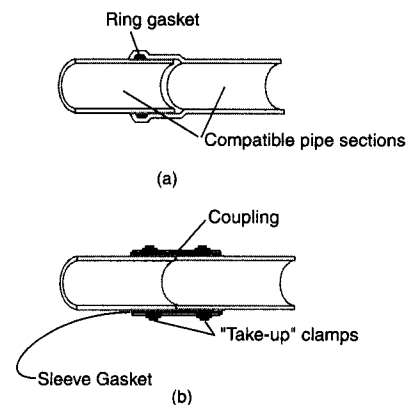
Pipe to pipe seals outside separator and for connecting internal "tees" and extensions: (a) using proprietary "bell" ends or pipes and (b) a typical sleeve coupling arrangement.
